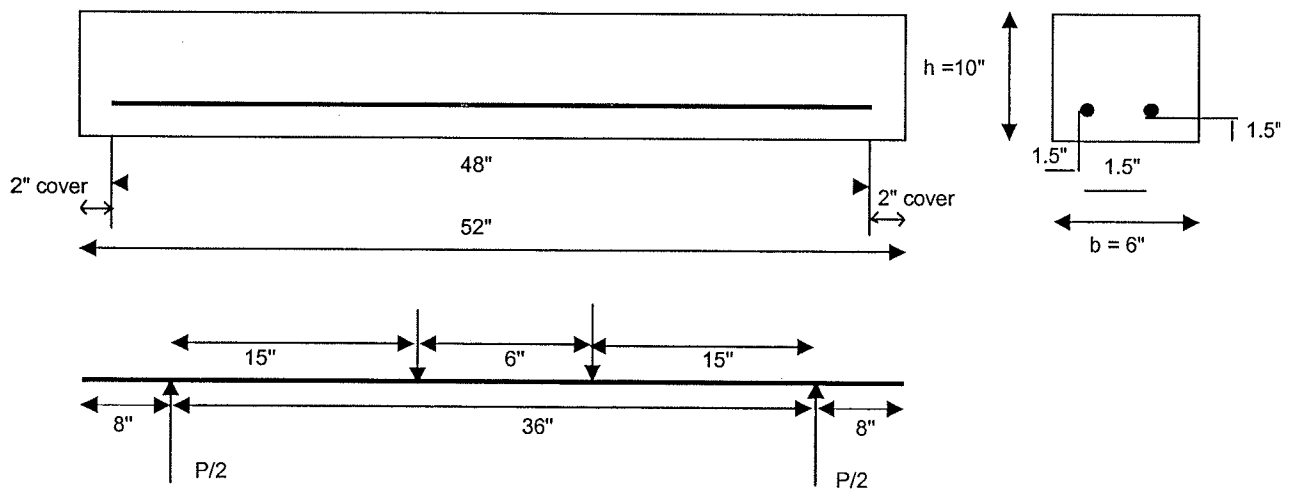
Details of reinforcement position and testing arrangement (BRC-3).
